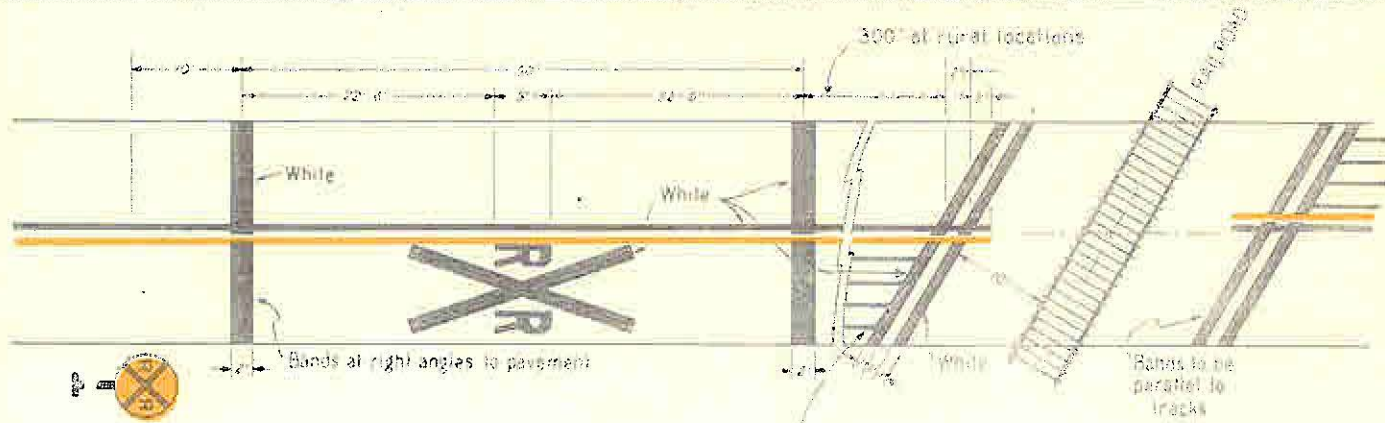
STANDARD PAVEMENT MARKINGS
